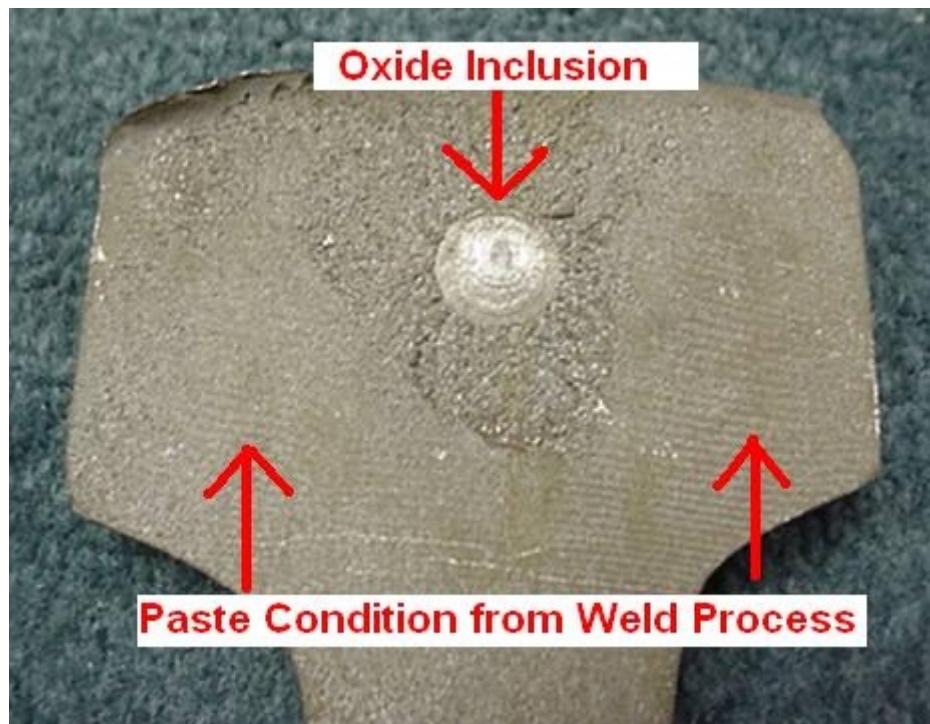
Gas Pressure Weld Showing Oxide Inclusion and Improper Fusion
